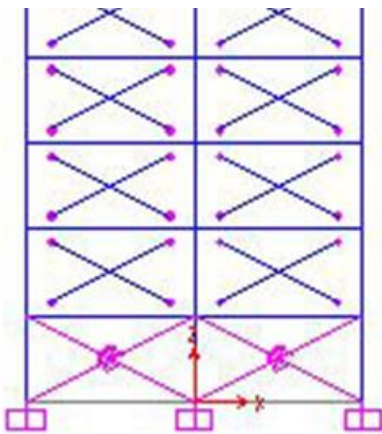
Elevation of Frame-2 with Friction Damper placed at ground floor (soft storey)
